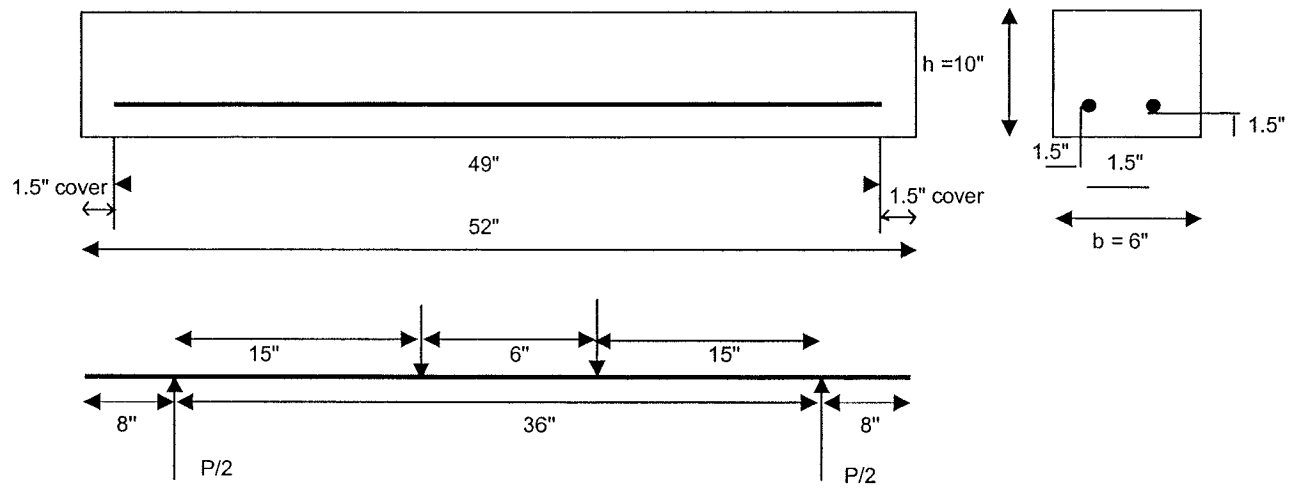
Details of reinforcement position and testing arrangement (BRC-4).
